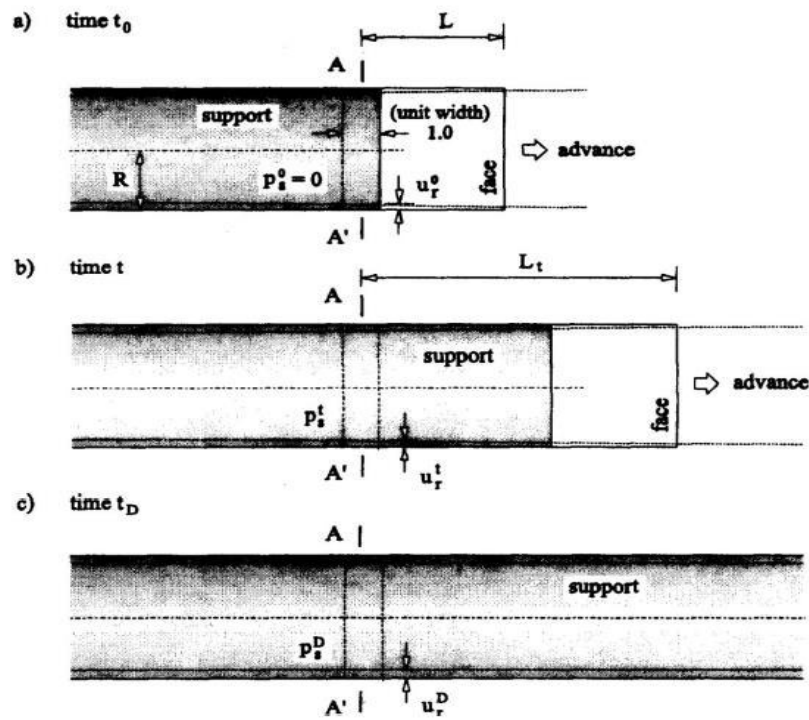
Loading of the support at section A-A' due to progressive advance of tunnel face(Carranza-Torres & Fairhurst, 2000)
